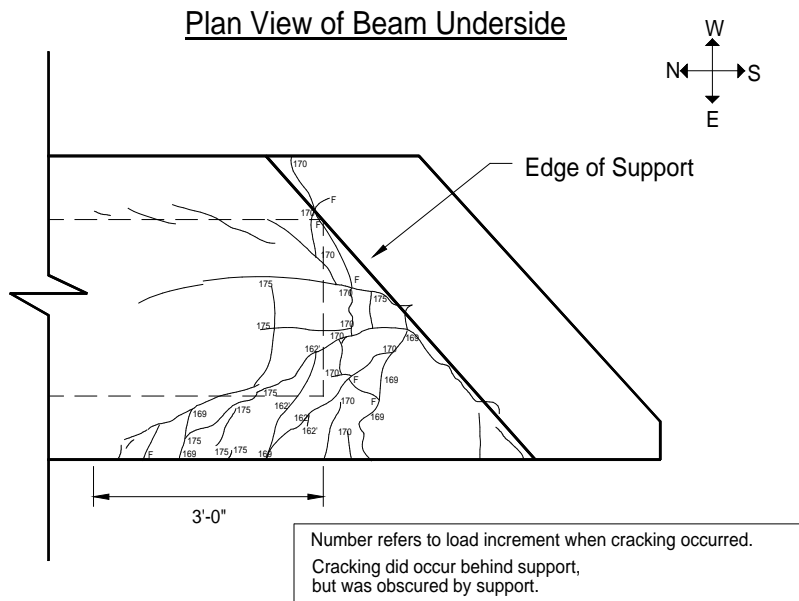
Post-test Cracking in Bottom Flange of Box Beam 3 - Test 1
